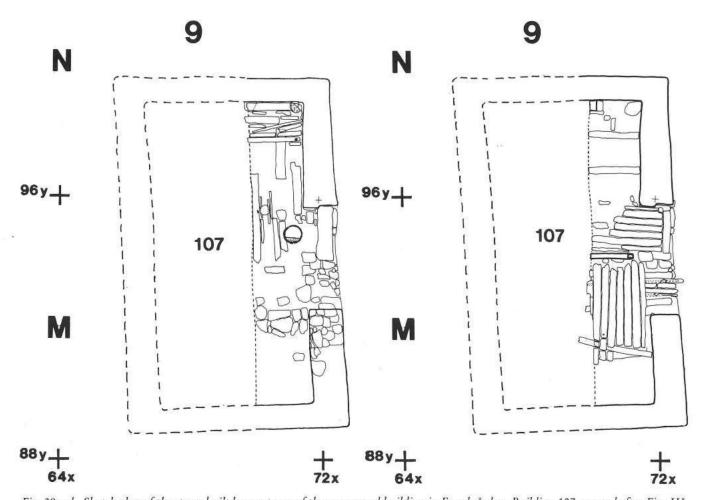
d. Sketch plan of the stone-built lower storey of the communal building in Engelgården, Building 107, erected after Fire III (1413) and demolished after the 1955 fire. a. (left) Earliest phase with two door-openings to the right, traces of a flagstone floor in the western part and a wooden floor to the east. b. (right) Second stage, also with two doorways and with the remains of an internal crosswall. Wooden floor in both rooms.
